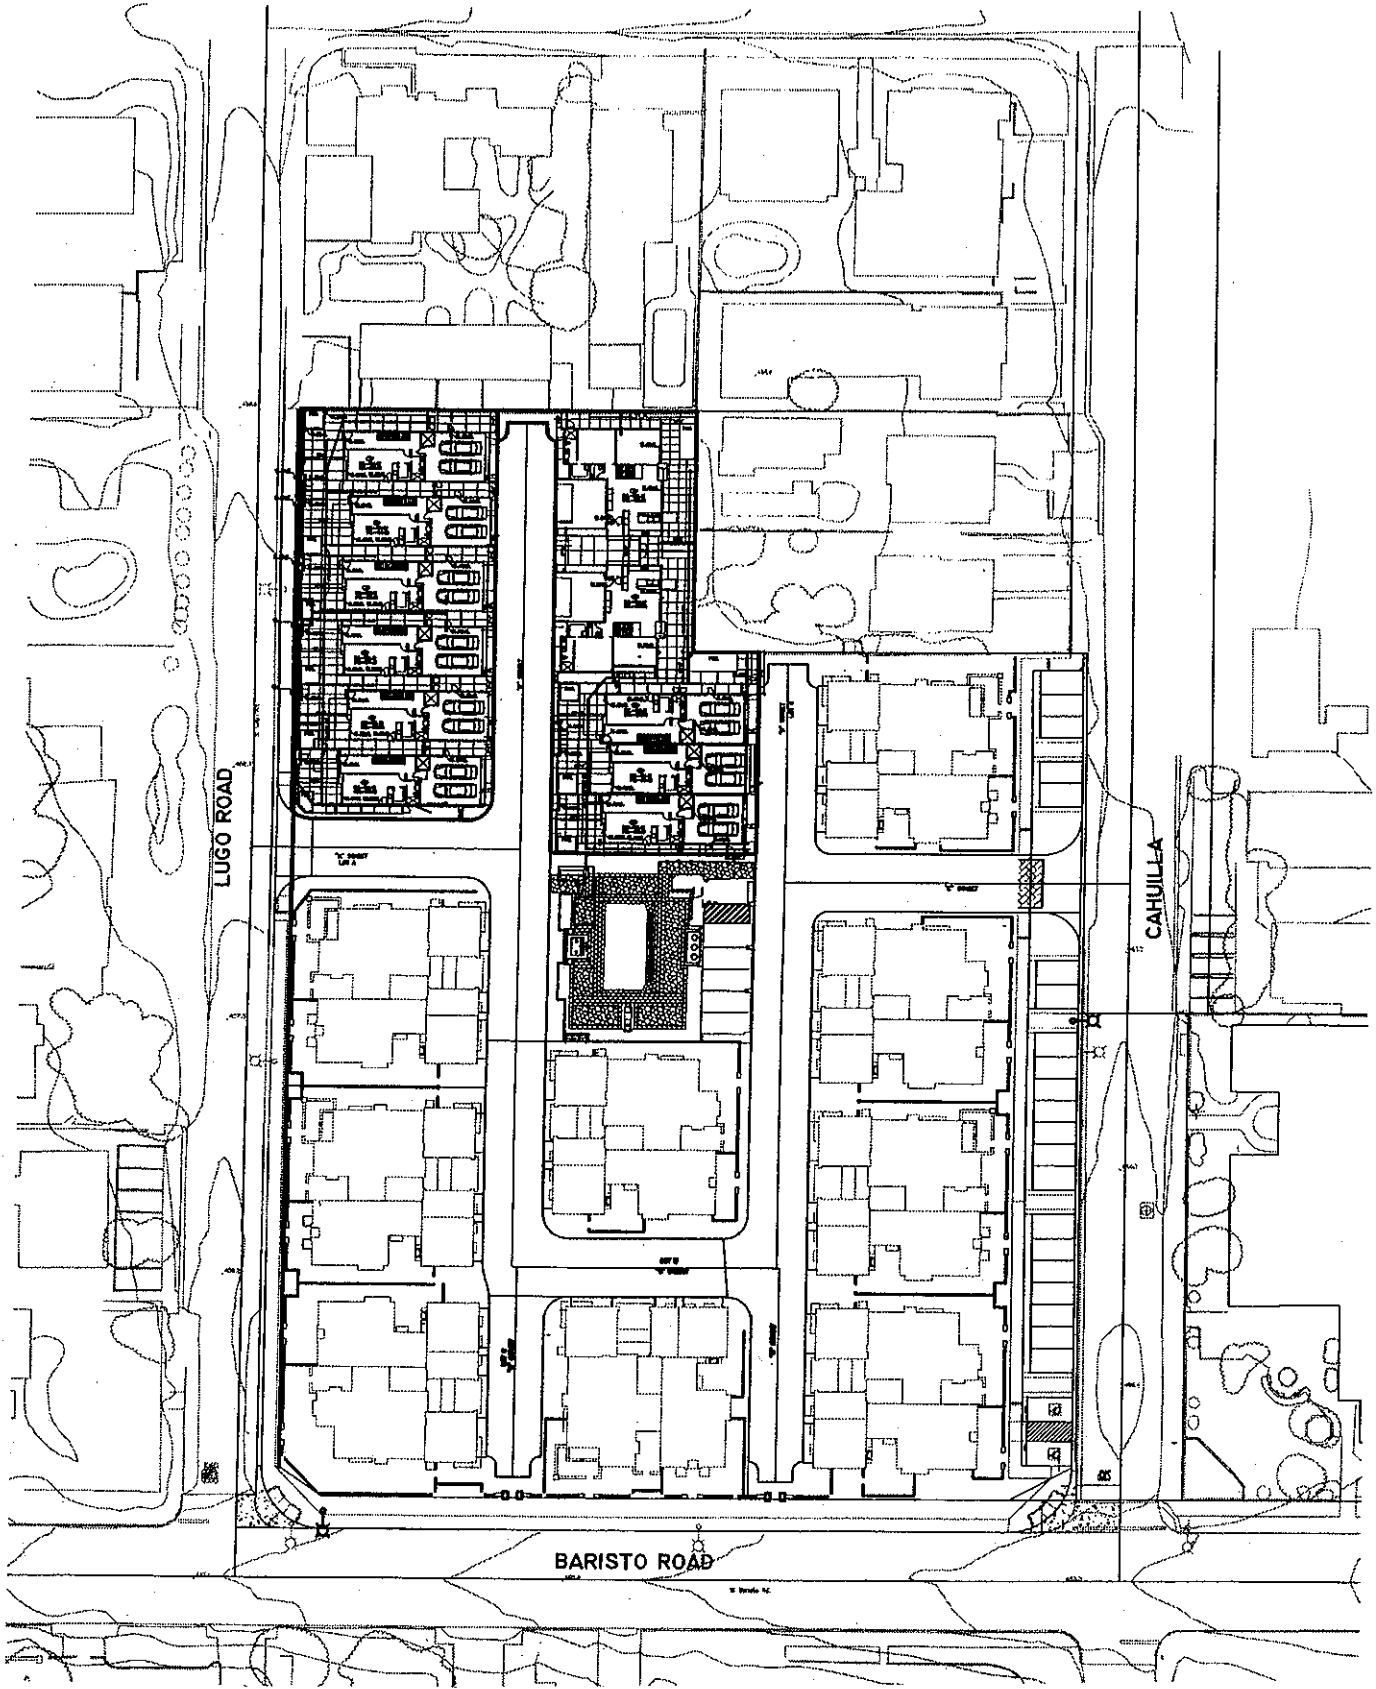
PROPOSED PROJECT SITE PLAN
